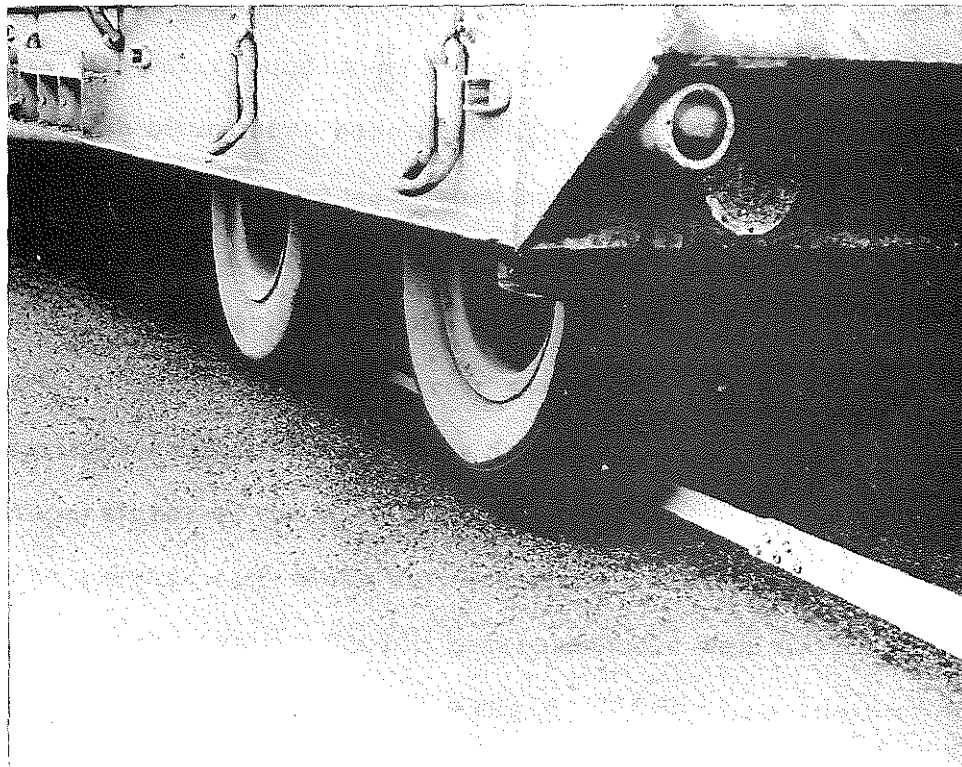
Benkelman Beam In-Place for Measuring Pavement Deflection Under 32,000- or 36,000-Lb. Loads on Tandem Axles.
